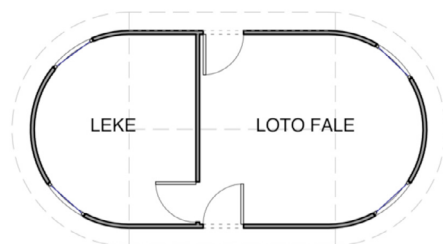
Floor plan of second type of aid house built for case study 2. This plan shows addition of a stud wall dividing the leke—a private sleeping area—and loto fale: a multi-purpose space for resting, meeting, and working as seen during fieldwork (not to scale), author 2013
